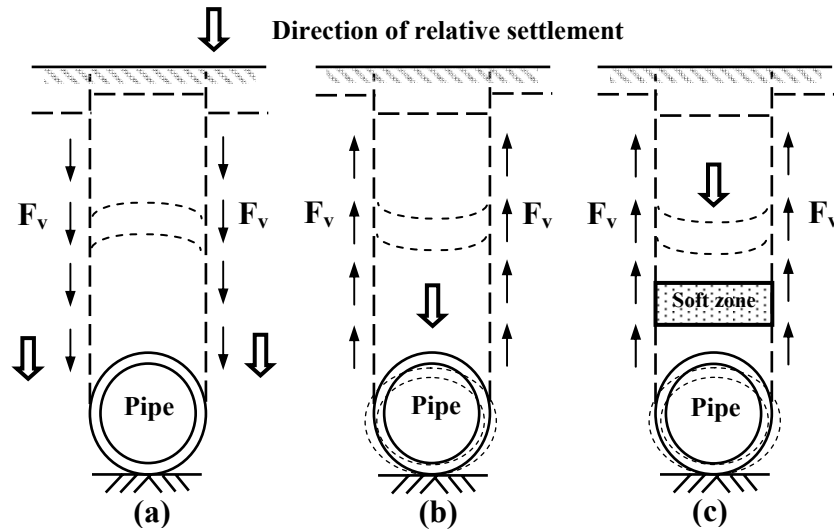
Pressure transfer within a soil-pipe system: (a) rigid pipe in embankment installation; (b) flexible pipe in embankment installation; and (c) rigid or flexible pipe in imperfect trench installation (F_v = generated friction forces or shear stresses)
